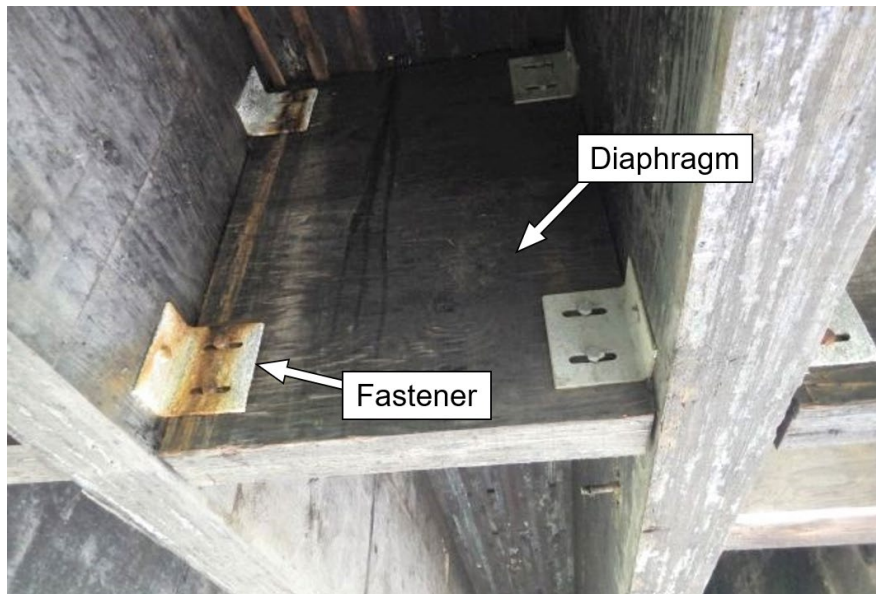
Timber Diaphragm with Corroded Fasteners
